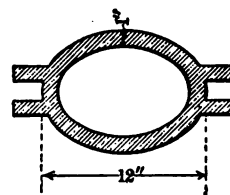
SIBLEY CAST-IRON SHEET-PILE.
